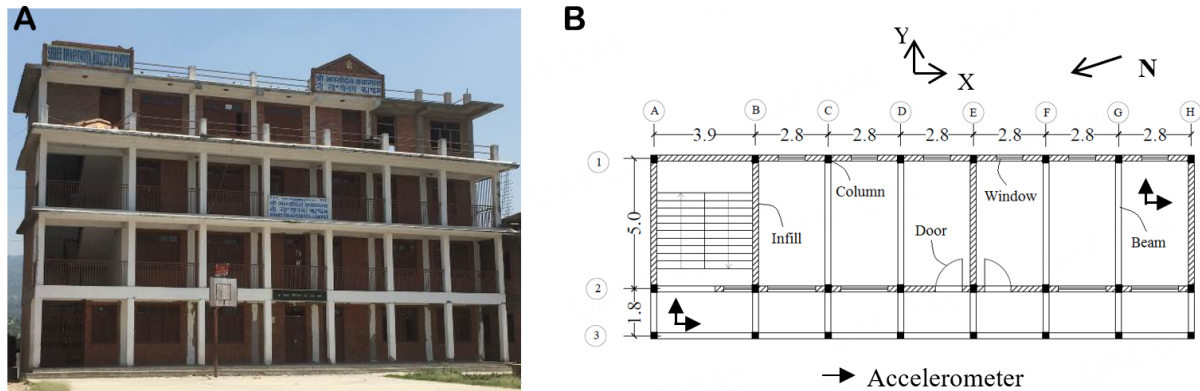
A four-story school building at Sankhu. (A) west elevation view from the entrance; (B) plan view (dimensions in m).
